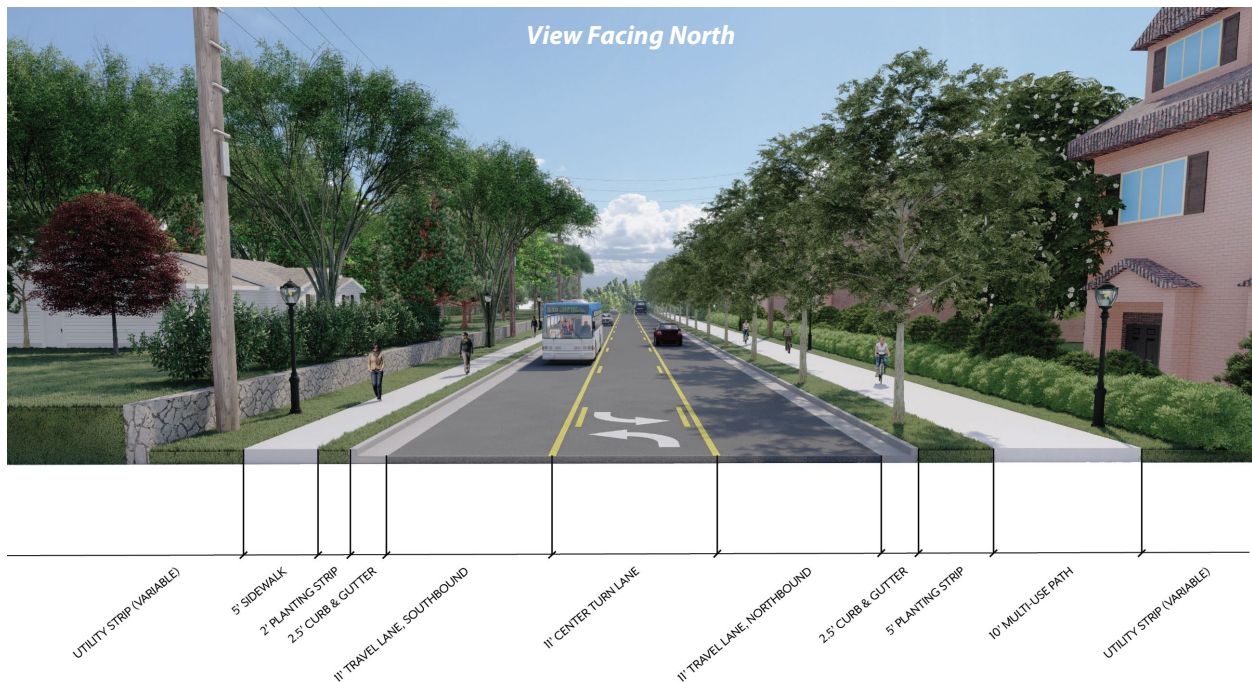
RECOMMENDED TYPICAL CROSS-SECTION FOR SEGMENT 4
